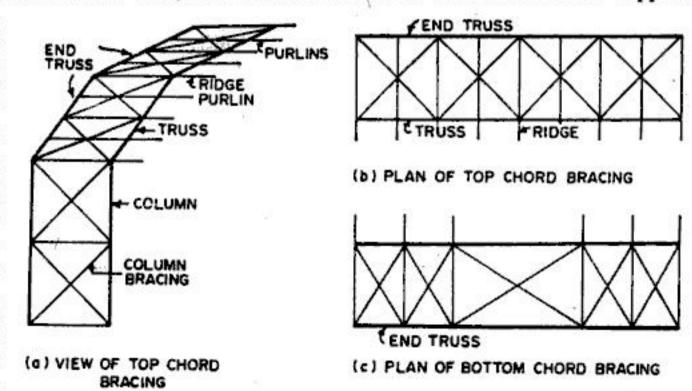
BRACINGS OF ROOF TRUSSES
